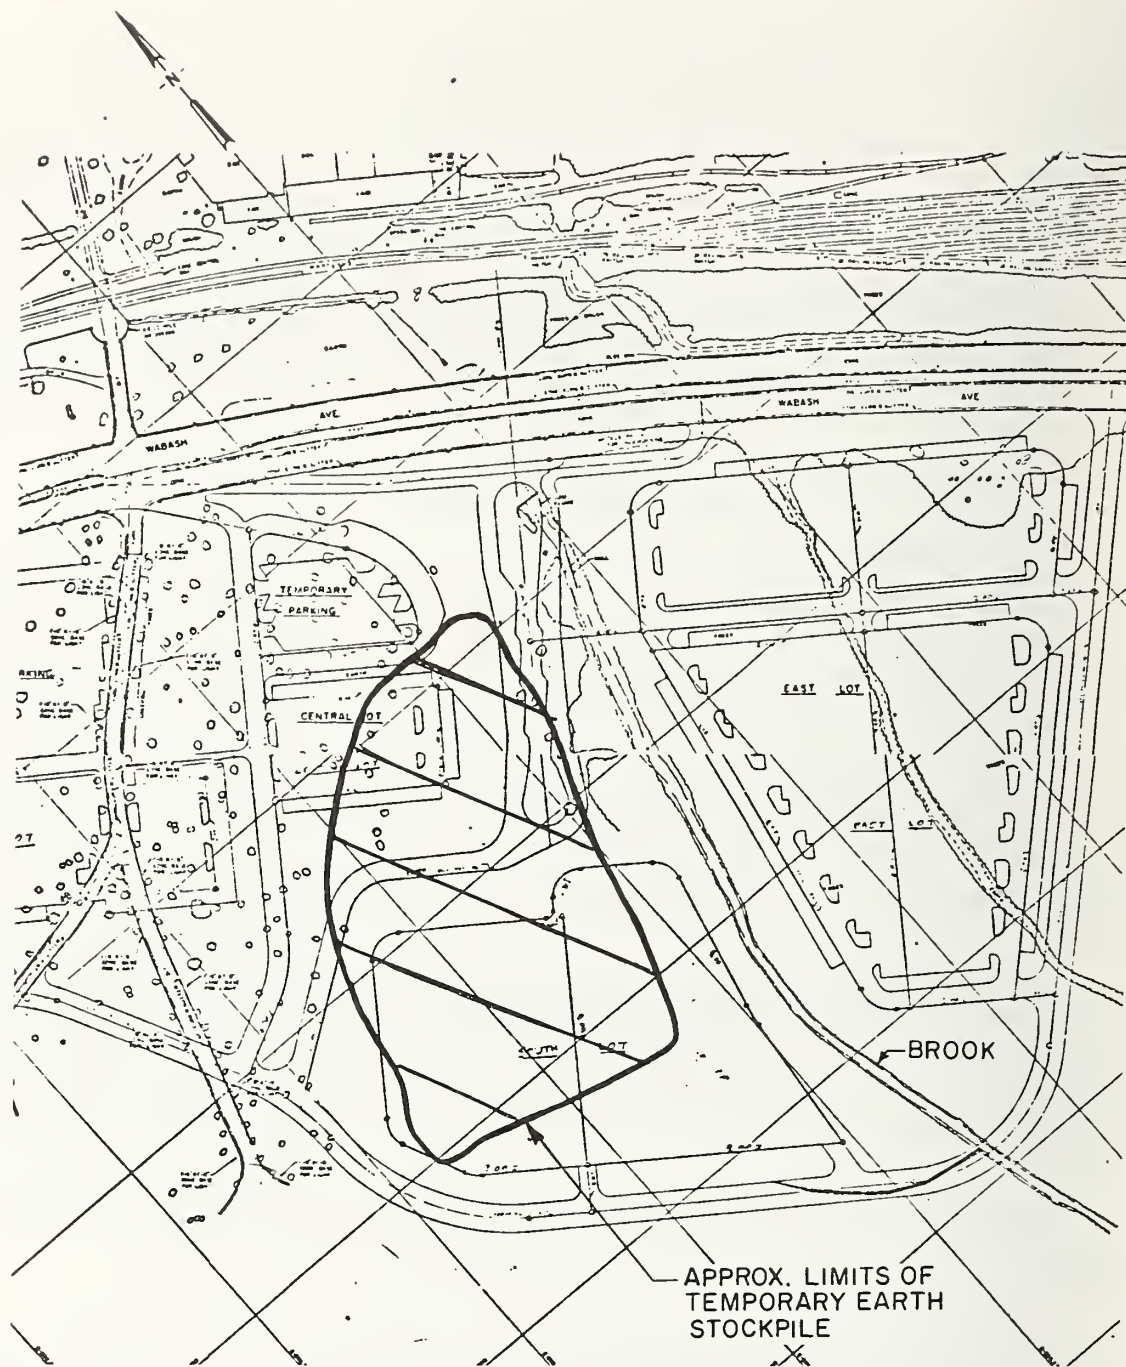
REISTERSTOWN SITE LOCATION PLAN
